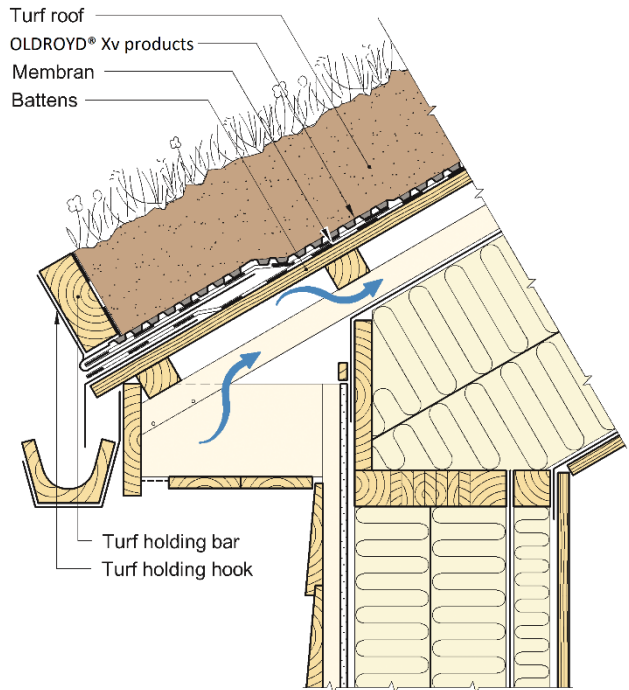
Example of the use of OLDROYD® Xv products as protection for drainage for of penetrating water between dimple sheet and roofing layer.
